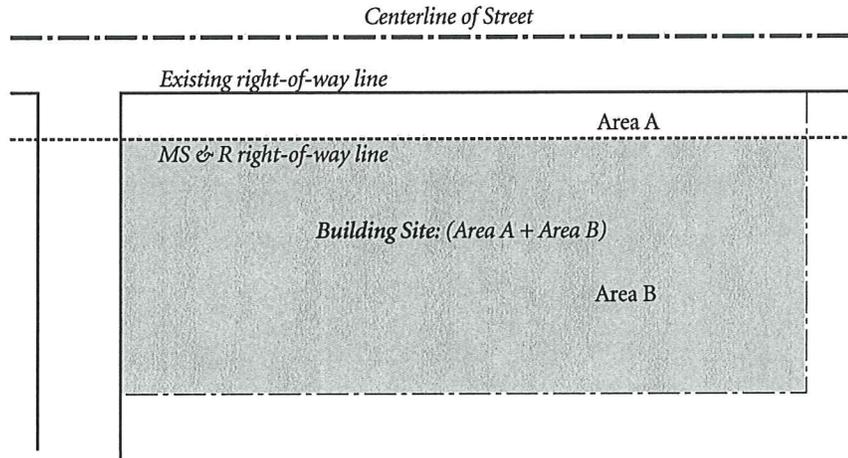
C: Adjustment of Off-street Parking Requirements
